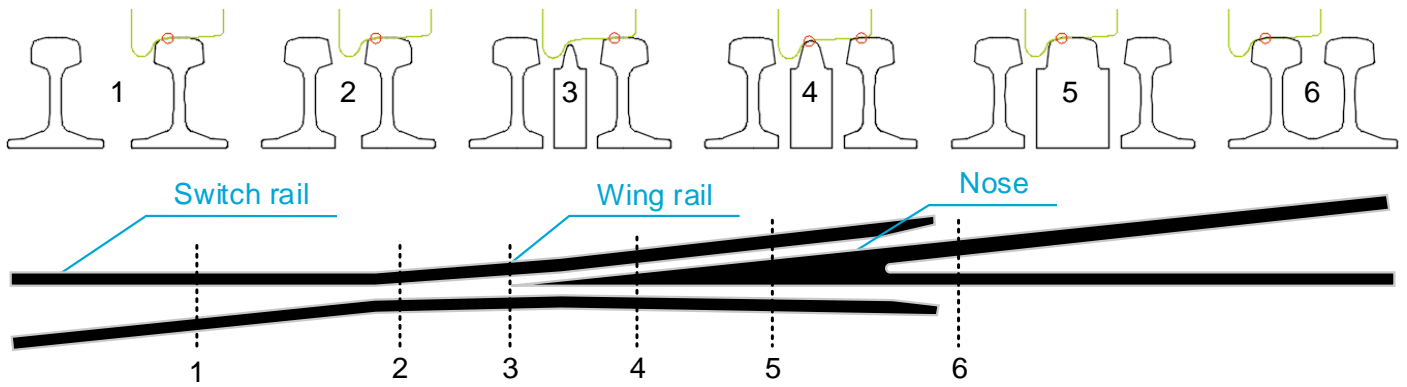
Regular wheel (green) with wheel-rail contact locations (red) throughout a crossing
